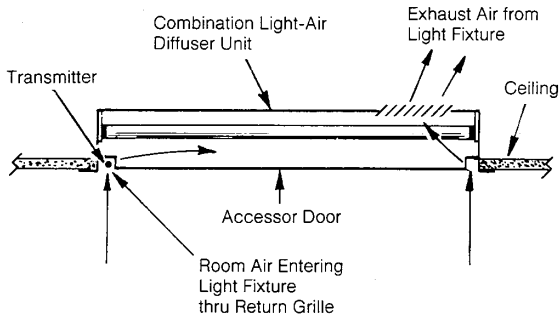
Locating TKS-6001 in Troffer End Opposite Exhaust Grill.
